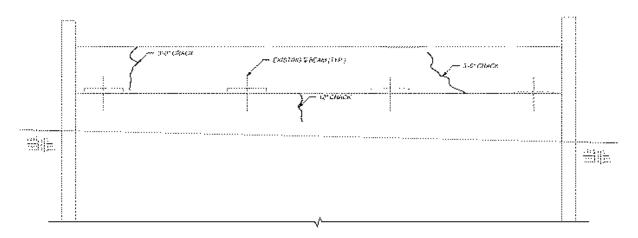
Location of Proposed Concrete Repairs - Forward (North) Abutment Elevation <u>MP 182.1</u>
